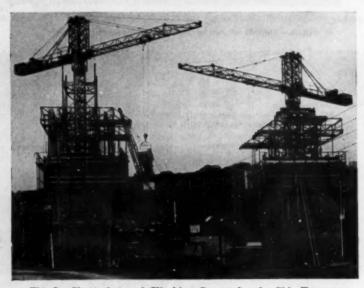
Shuttering and Climbing Cranes for the Side Towers.
